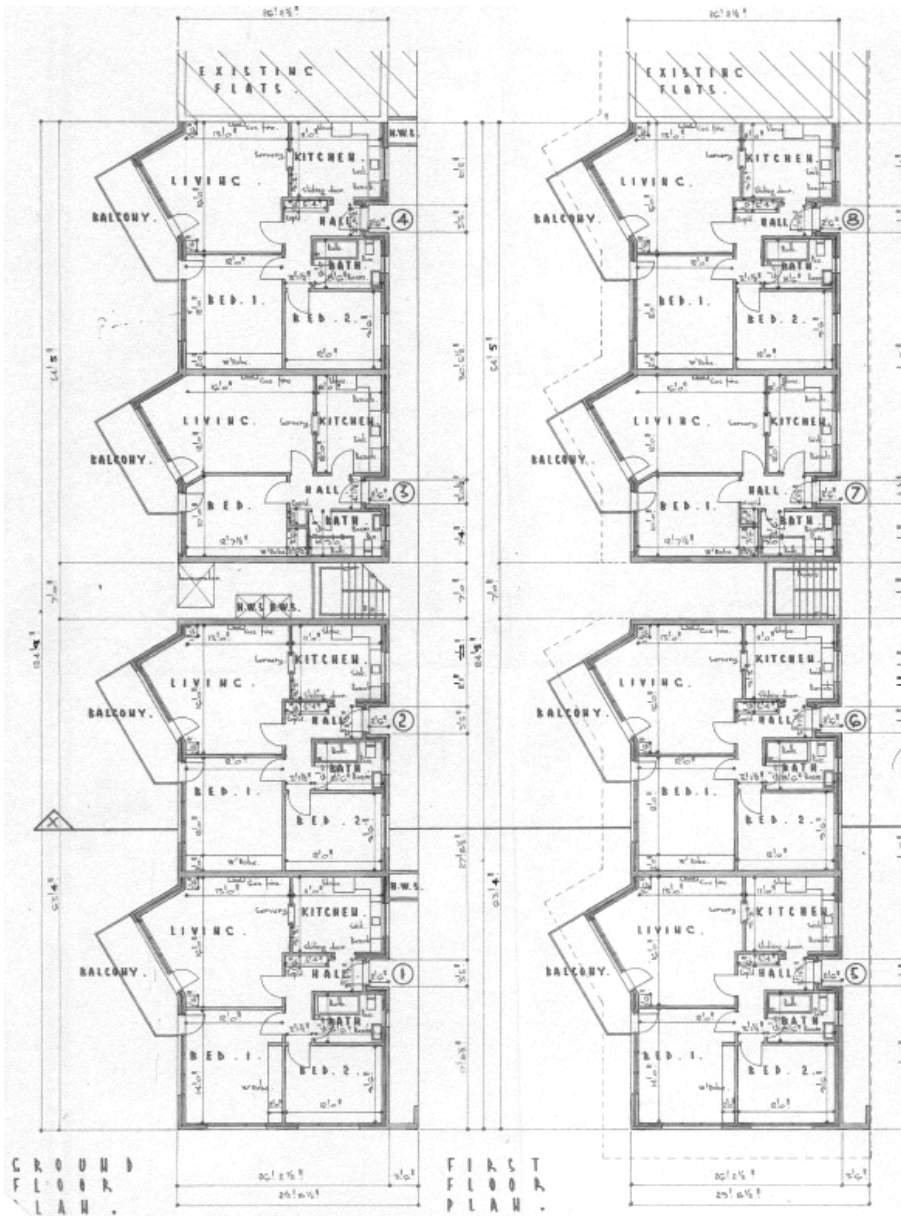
Undated drawings (elevations and plans) relating to building permit 57/131 issued February 1958. (Source: Council Building File)
